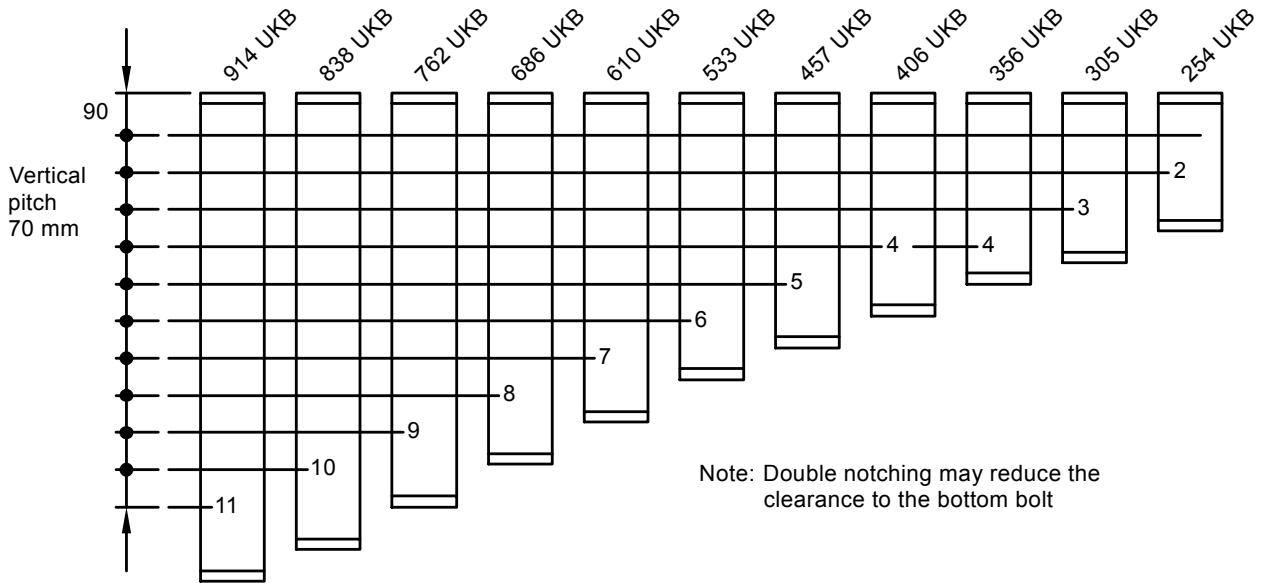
Vertical bolt layout (beam end connections using M20 bolts)
